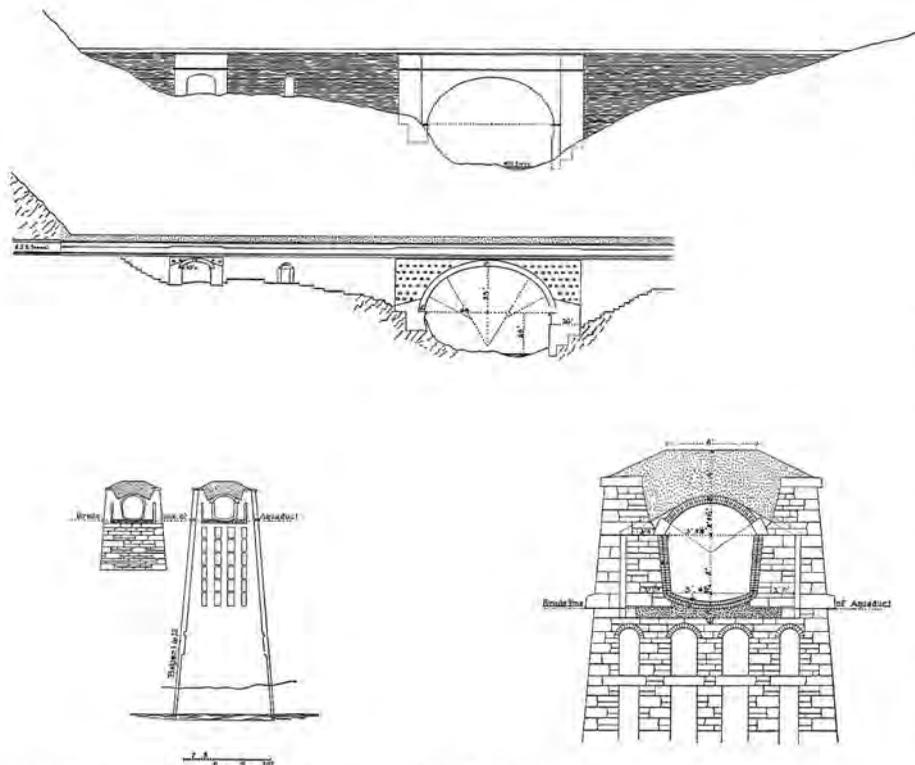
Old Croton Aqueduct. Sing Sing Kill Bridge. Elevations and cross sections.
